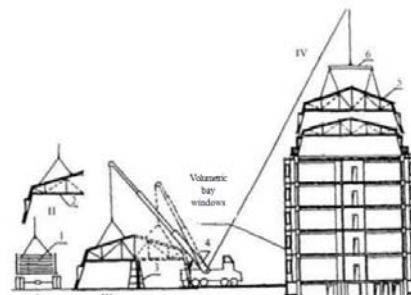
Schematic diagram of the technology for superstructure of an attic floor with enlarged metal block sections without widening the body (first option): I – unloading of half-spans of block sections; I – truck with spans; II –
